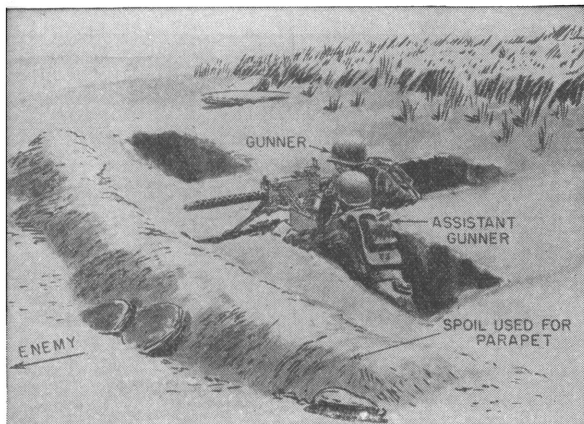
Caliber .30 machine-gun (light) emplacement, fox-hole type.
